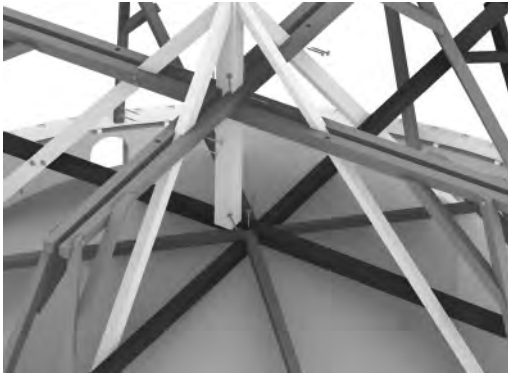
Nailed connections of the collar-beams with the struts and king-post (3D model: author).
